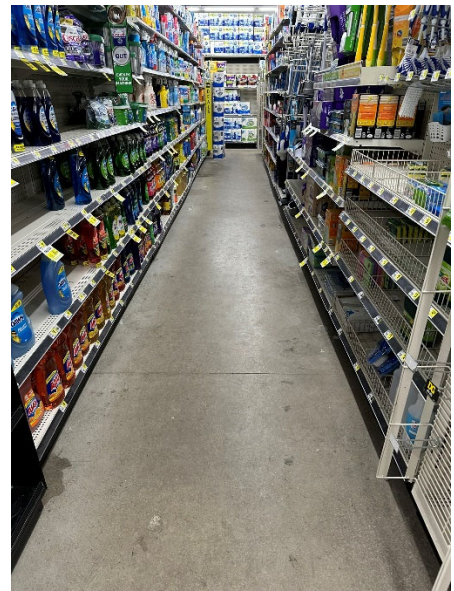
Interior, looking down aisle, notice intact concrete floor.
